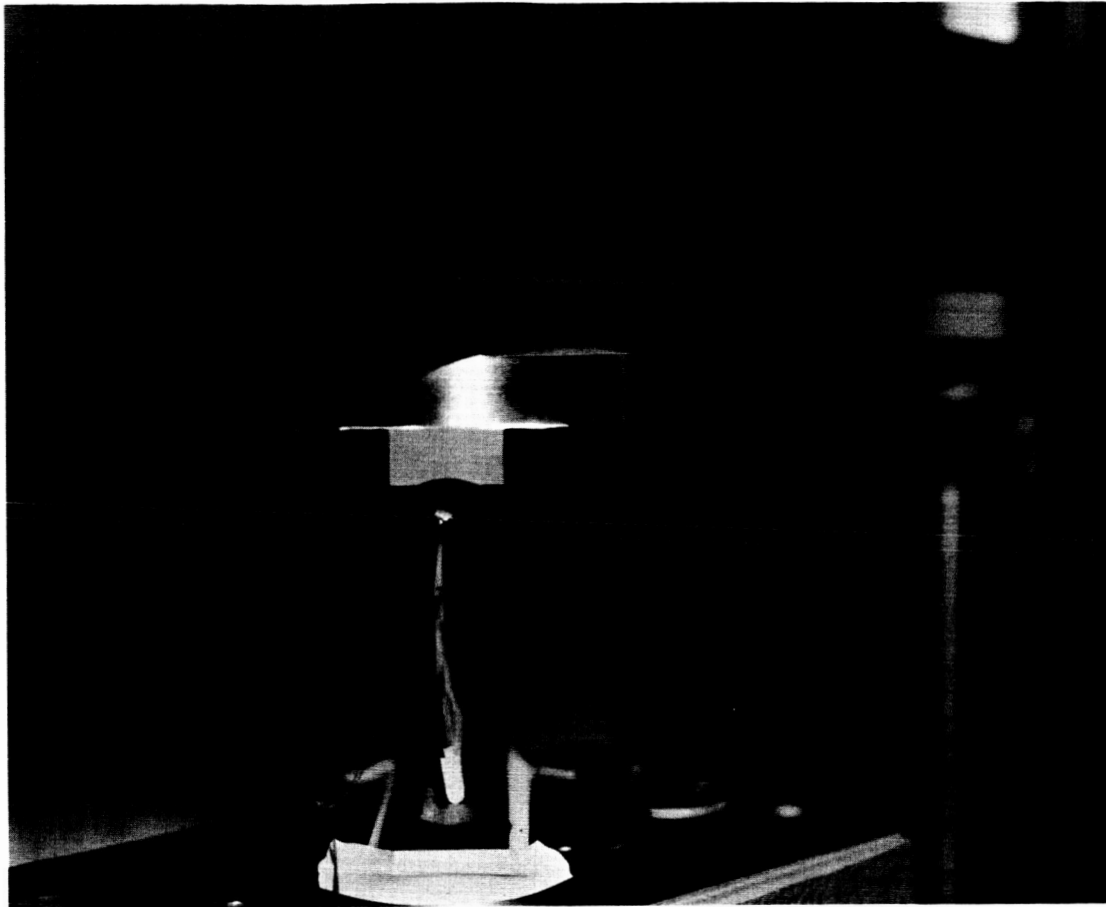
PHOTO SHOWING BUCKLING OF SPECIMEN
